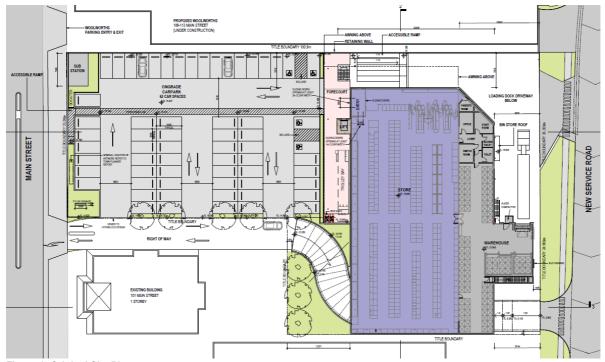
Original Site Plan Source: Rothelowman Architects, 2017
